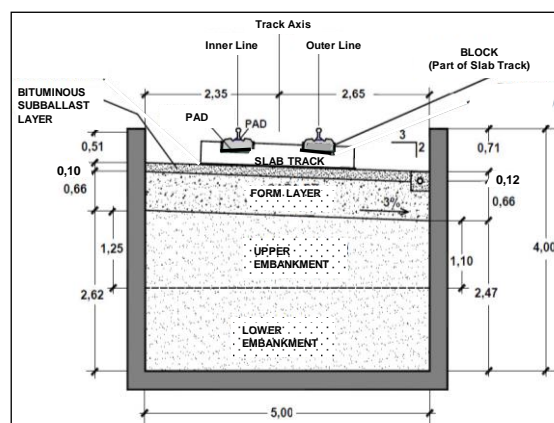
CROSS-SECTION OF 1:1 SCALE MODEL BUILT IN CTB (DIMENSIONS IN M)
